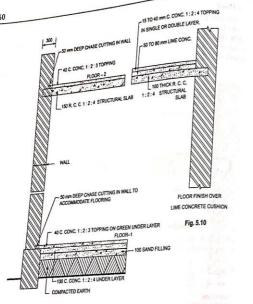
FLOOR-AT UPPER FLOOR LEVEL
